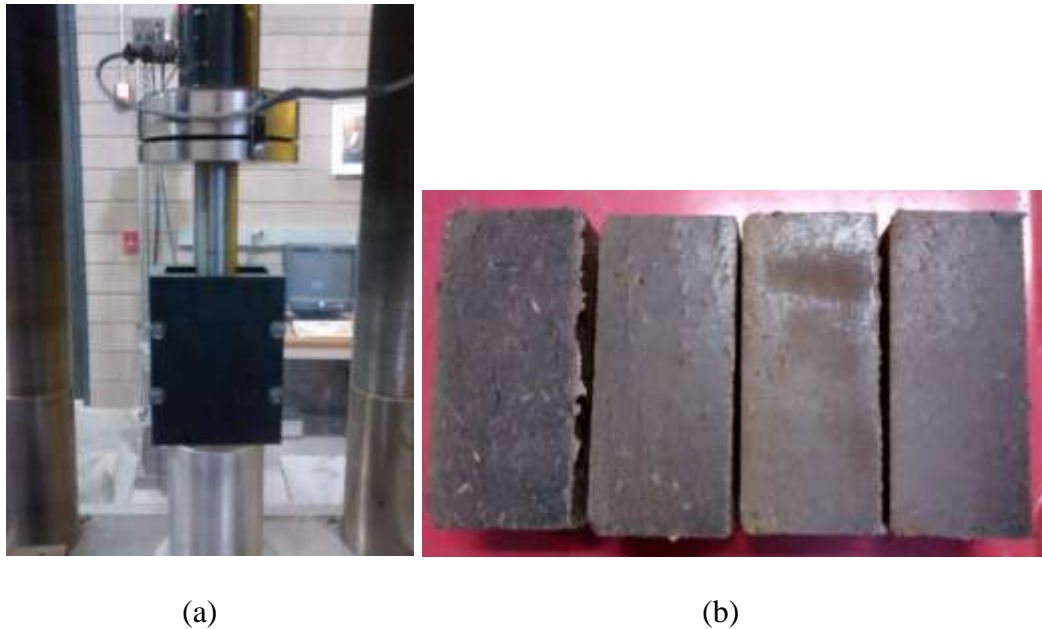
(a) CSEB Production Using SBEL Compression Machine; (b) Blocks Stacked After Extraction
